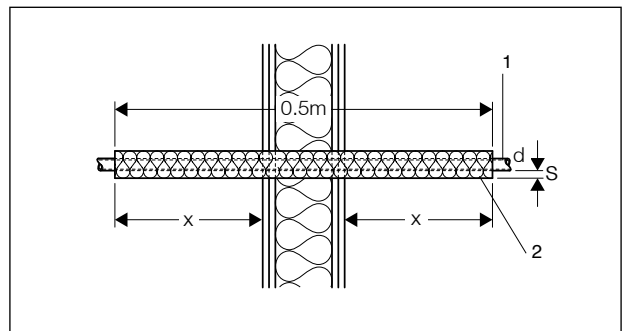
Fire protection Geberit Mepla  $\varnothing$  16 - 75mm: Wall penetration for drywall installations
